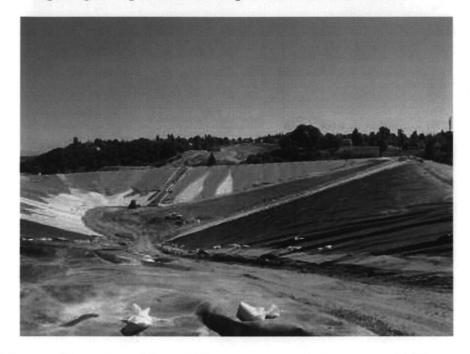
ramp fill constructed from cell bottom up to southwest corner of OCF.
